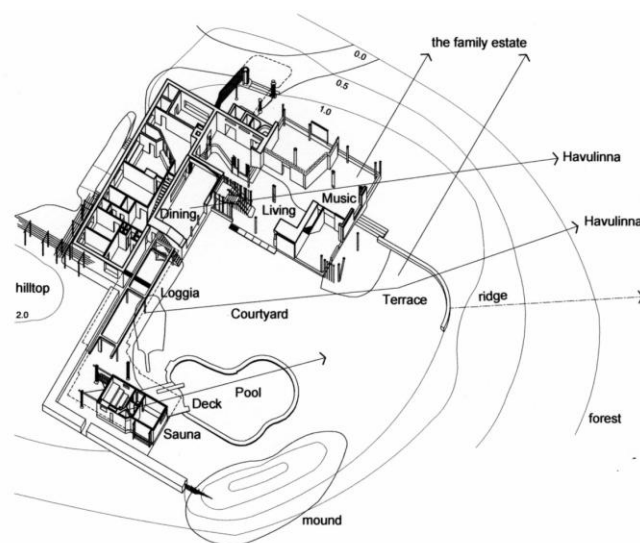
EXCAVATION, LEVEL LAND AND ELEVATION
